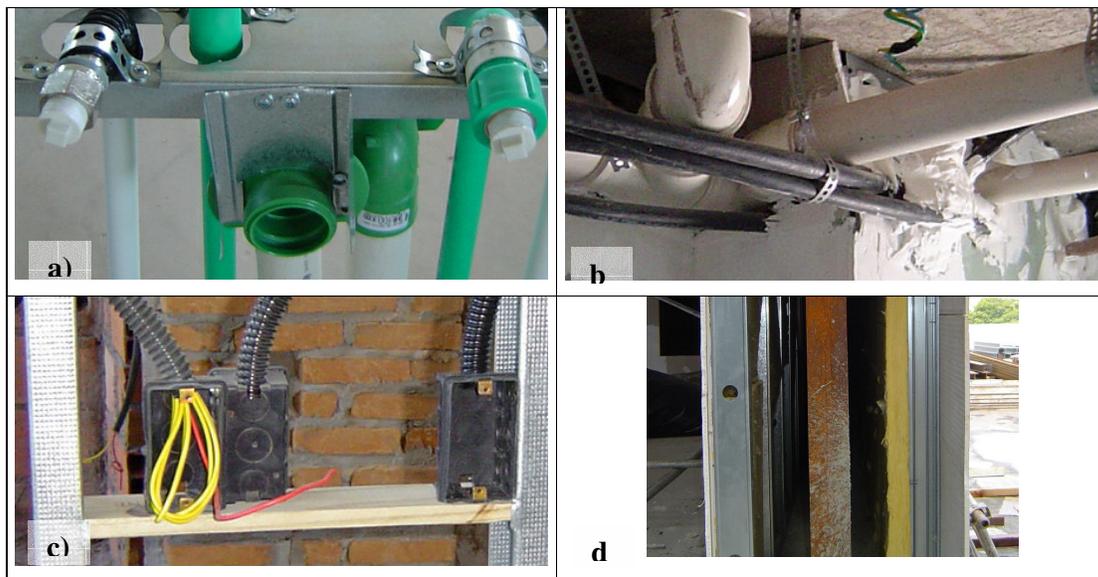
Examples of sound transmission paths found: a) pipes with no resilient isolation; b) pipes glued to gypsum board walls; c) back-to-back electrical outlets in the same structure; d) better sound insulation performance of gypsum wall.
